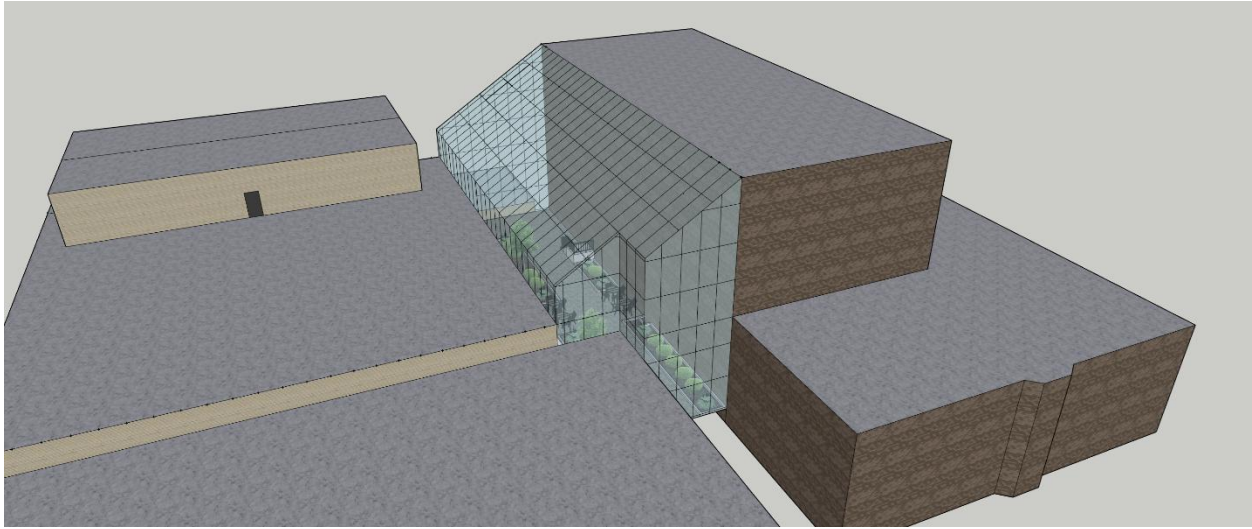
Design Concept 2 - Greenhouse Style Atrium Roof for Alumni Way
